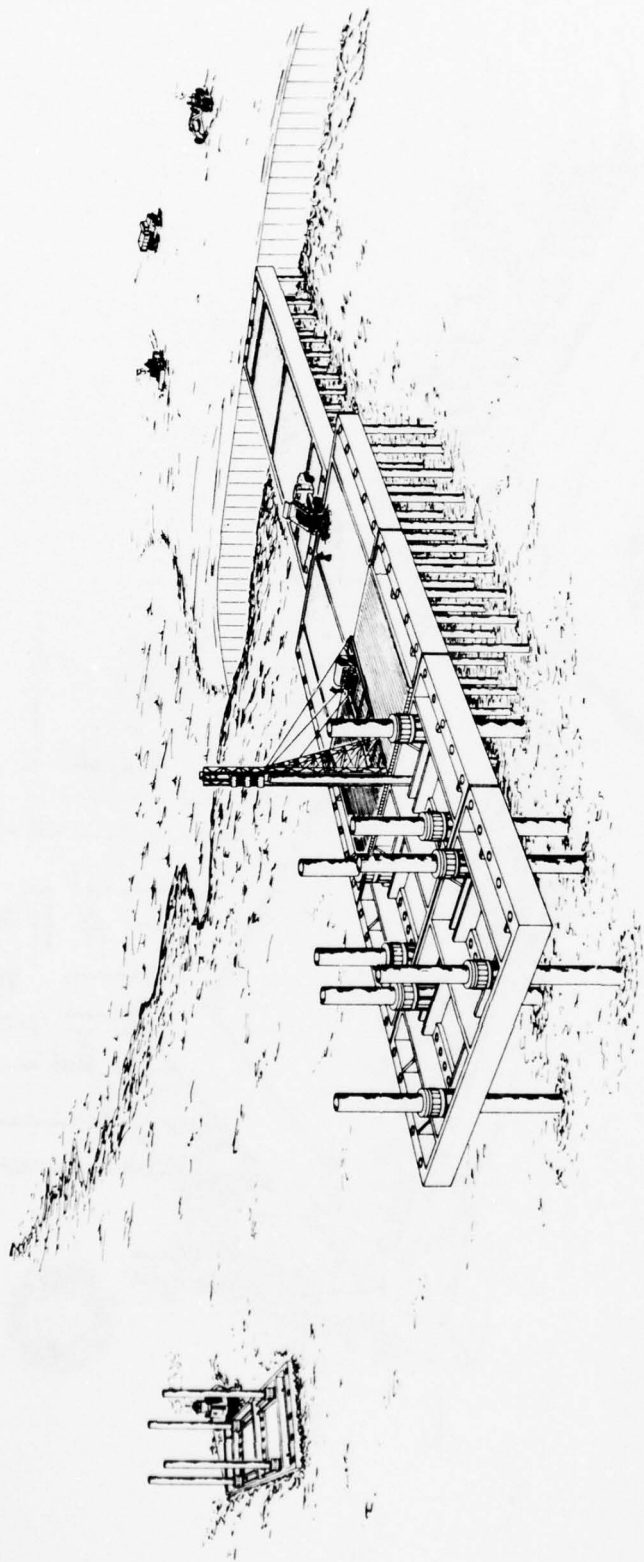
Artist's concept of concrete pier module installation (from Reference 52)
